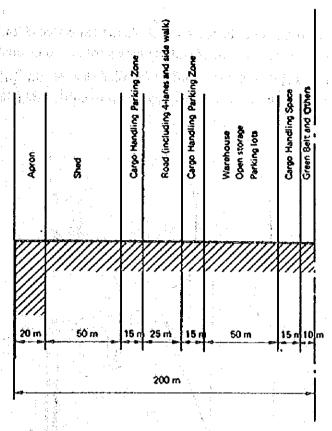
Cross Section of Break Bulk Cargo Terminal Facilities
